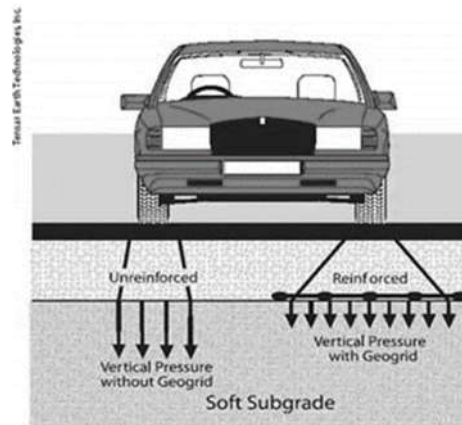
Geogrid reinforced in road pavement (csengineermag, 2014)
